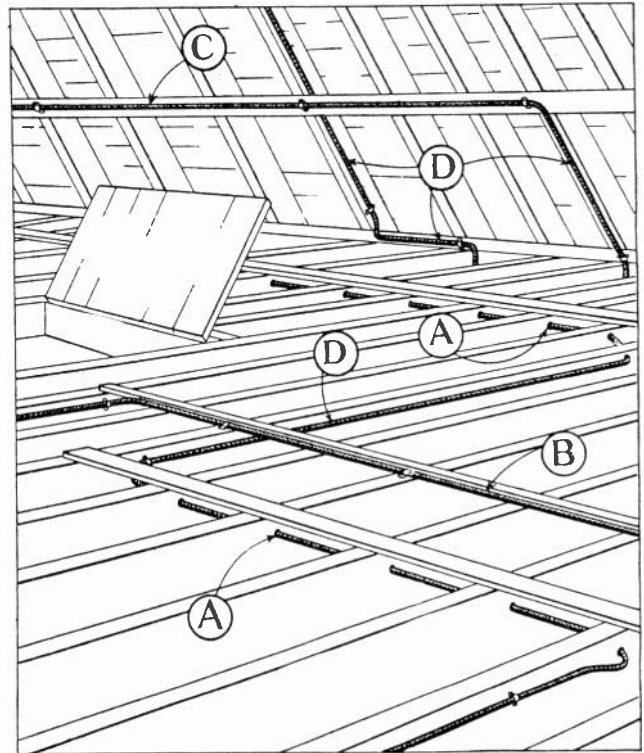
RomeX is a very convenient type of wiring to install in the attics and walls of finished buildings.
